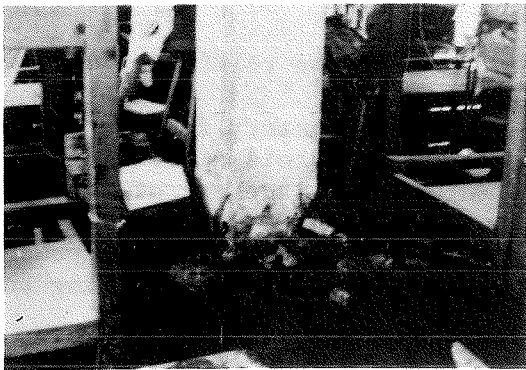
Damage at the bottom part of a column in the 2nd floor.
